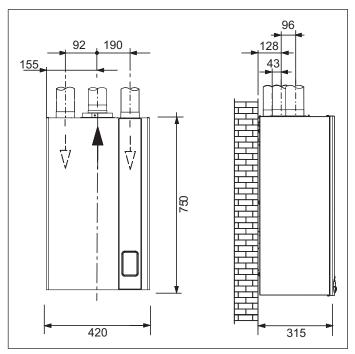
Coaxial ducts C43 - C53 - C83 dimensions
